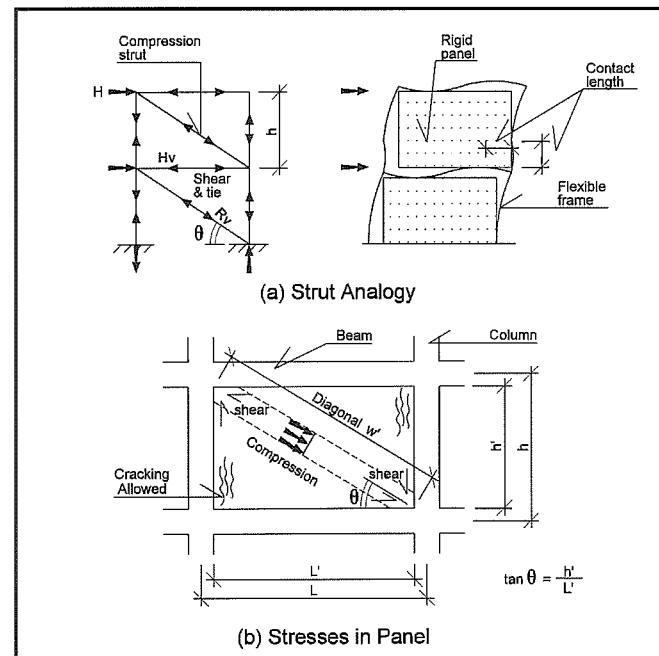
Infill Wall Panel Design Principles (reference 7)
